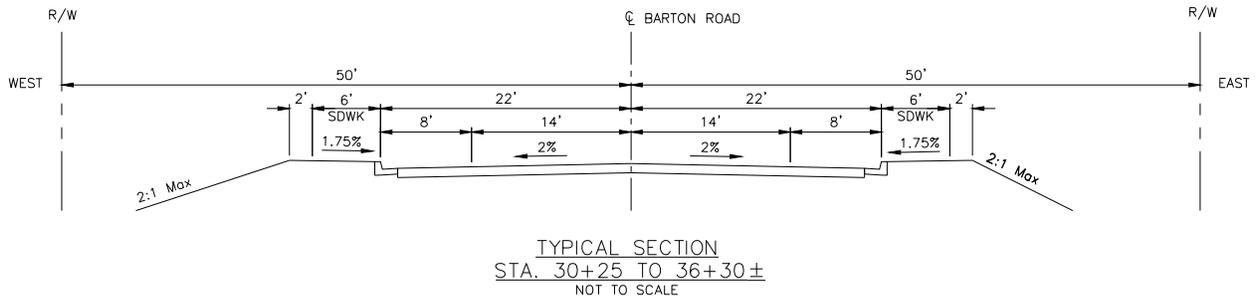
BARTON ROAD TYPICAL SECTIONS
